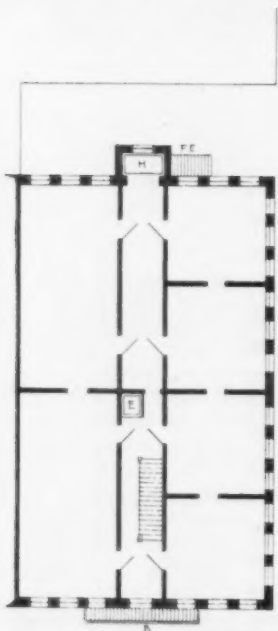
Plan of a Buffalo Tenement Factory. E, Passenger-lift; H, Goods-lift; F. E., Fire-escape; B, Escape Balcony.
